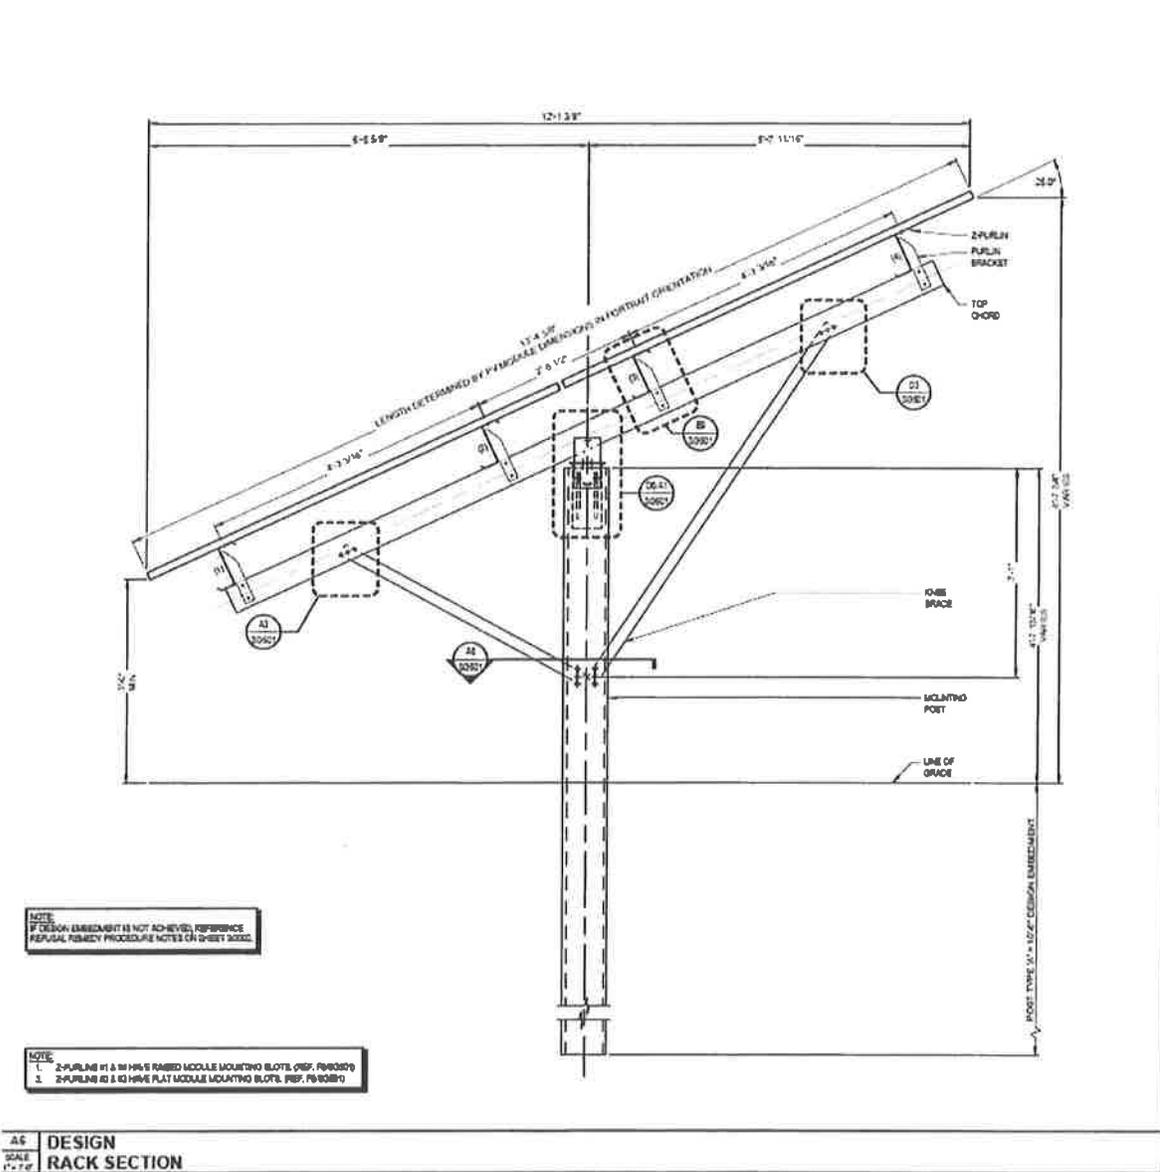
Snip from the racking construction drawings showing a cross-section of the racking, above and below grade.
